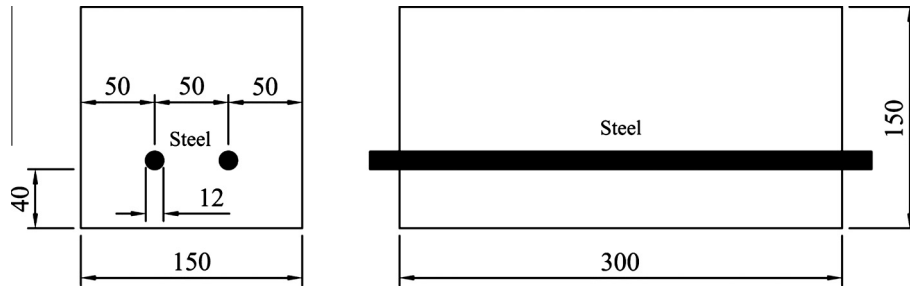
Schematic of the reinforced concrete specimen (dimensions are in mm).
